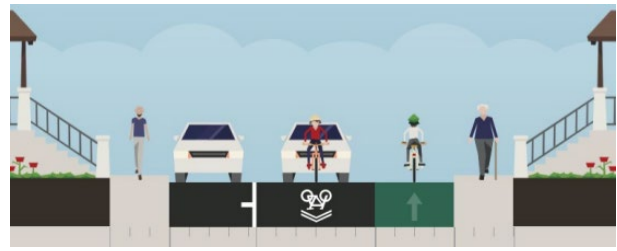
Illustration showing the proposed changes on Emerson Avenue between Wallace Avenue and Paton Road, facing north.
